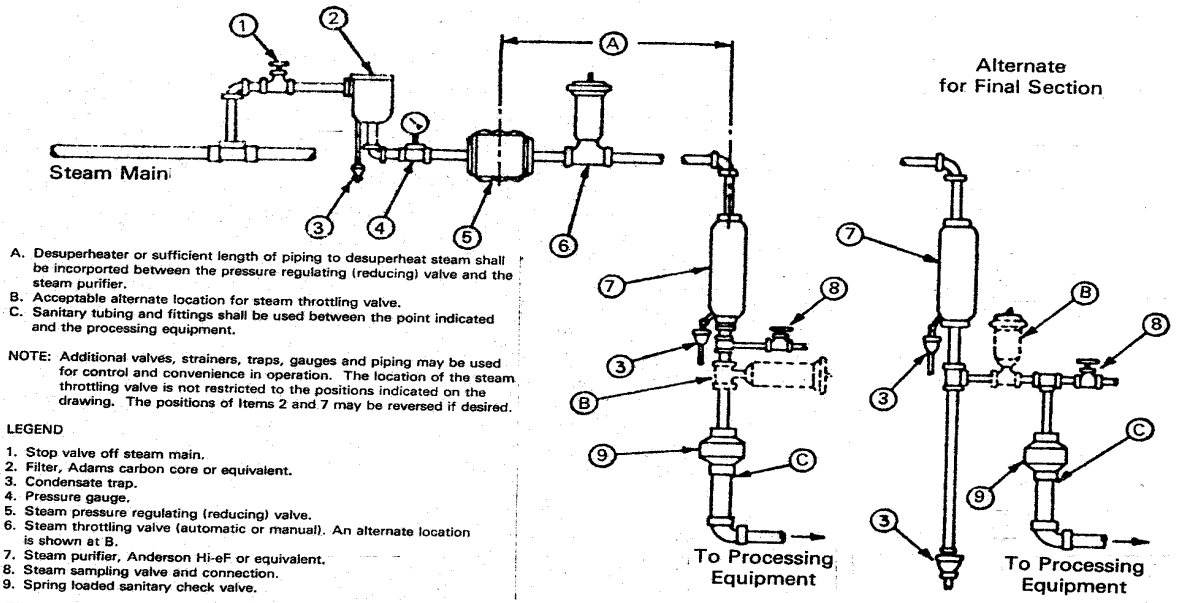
Culinary Steam Piping Assembly for Steam Infusion or Injection
